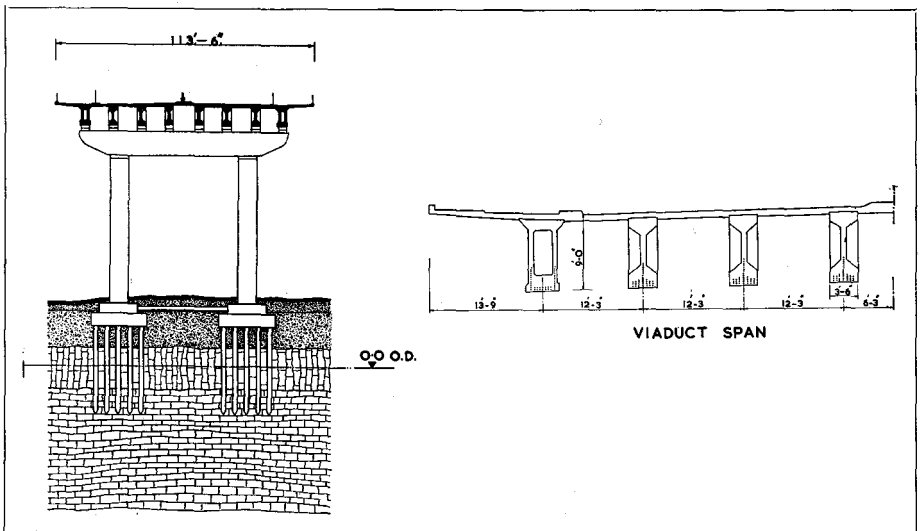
Section through a typical Viaduct Span at a Pier.
